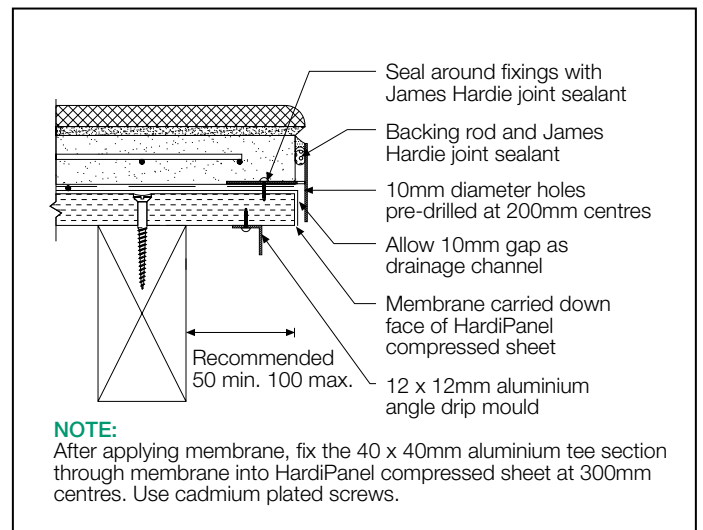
METHOD 1 - DECK EDGE DETAIL USING ALUMINIUM TEE SECTION
